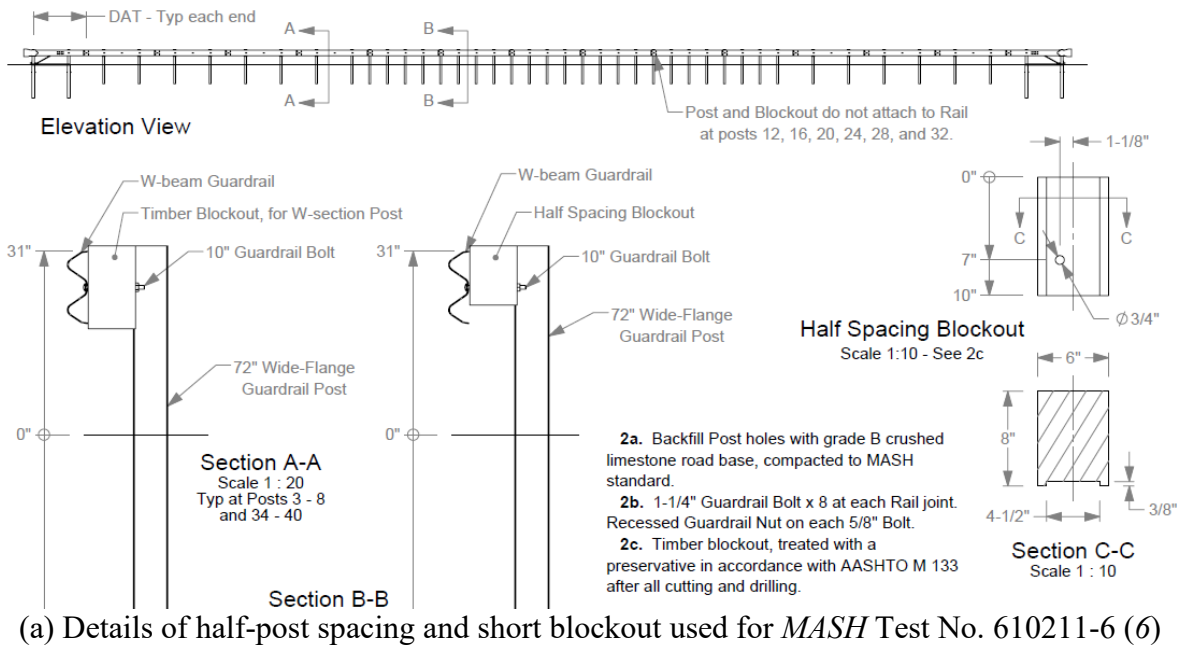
Details of Half-Post Spacing and Short Blockout.
